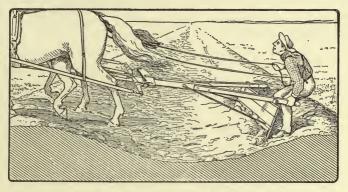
Showing plank scraper in use, placing the embankment all on one side of the ditch.
